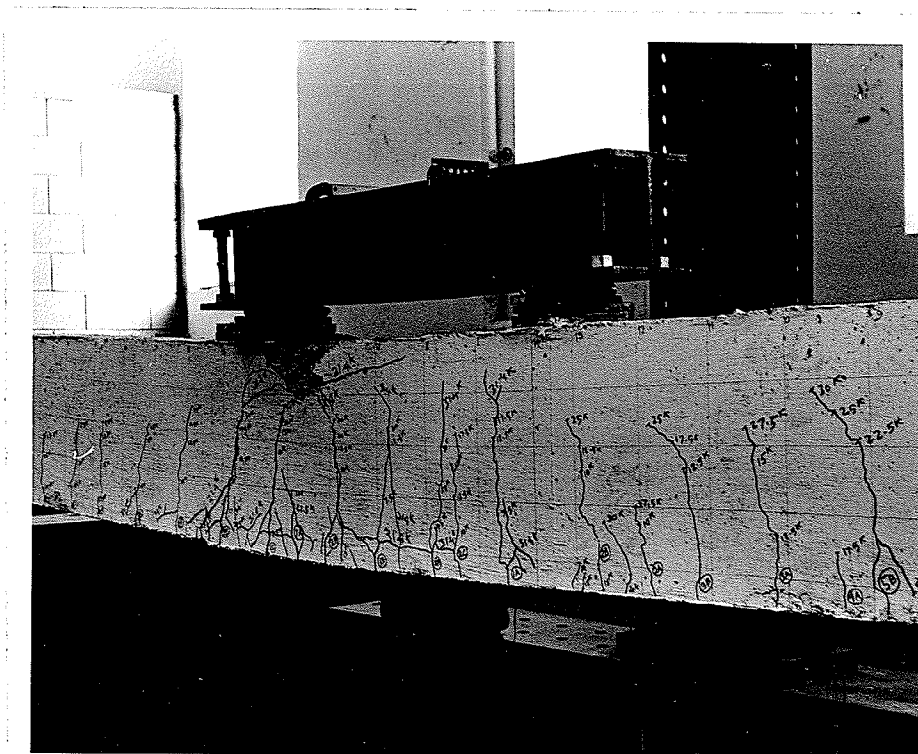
CRACKING AND FINAL FLEXURAL FAILURE OF BEAM IC-6
